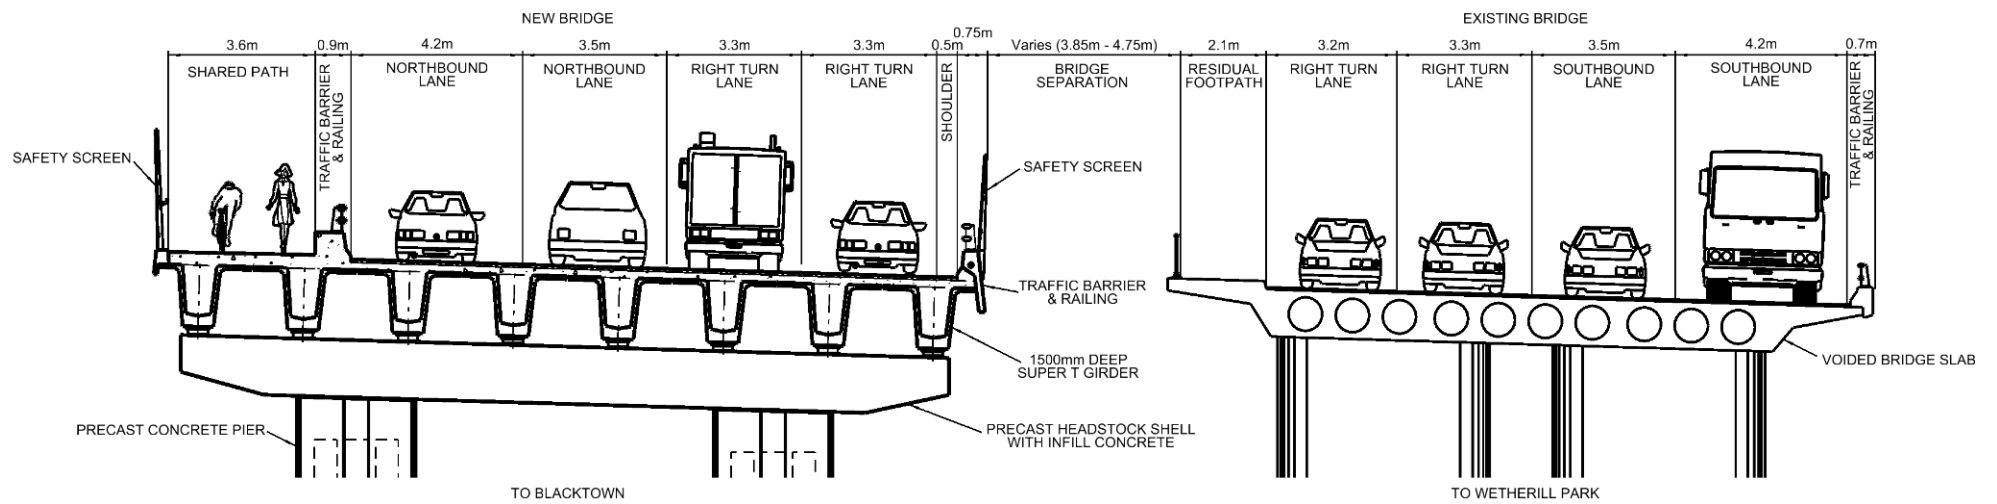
Typical bridge section— M4 Western Motorway bridge
